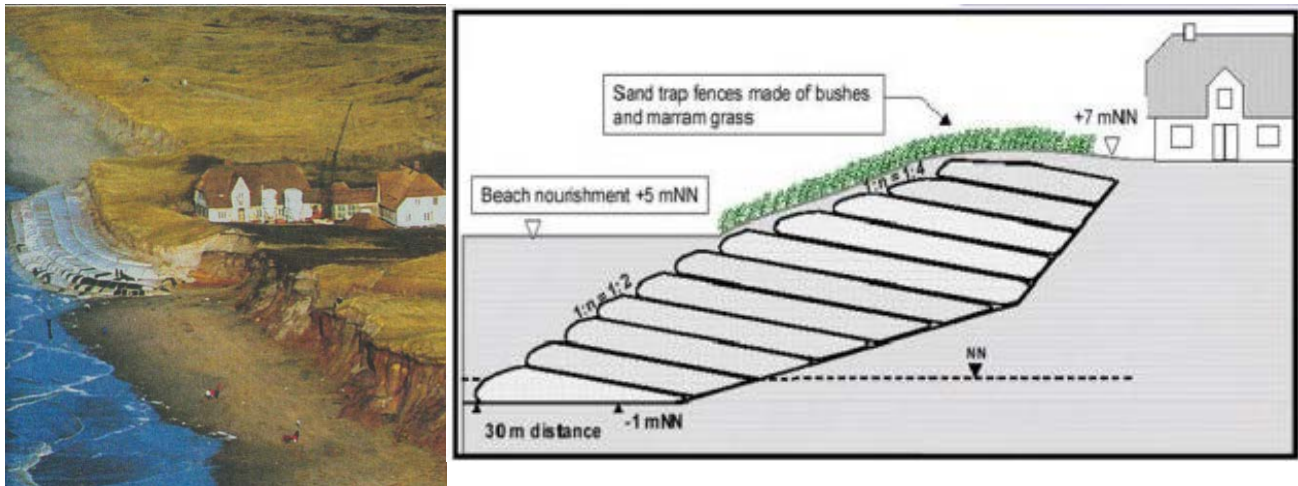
Geotextile-reinforced gravity revetment on the Island of Sylt, Germany (Oumeraci & Recio 2010)
